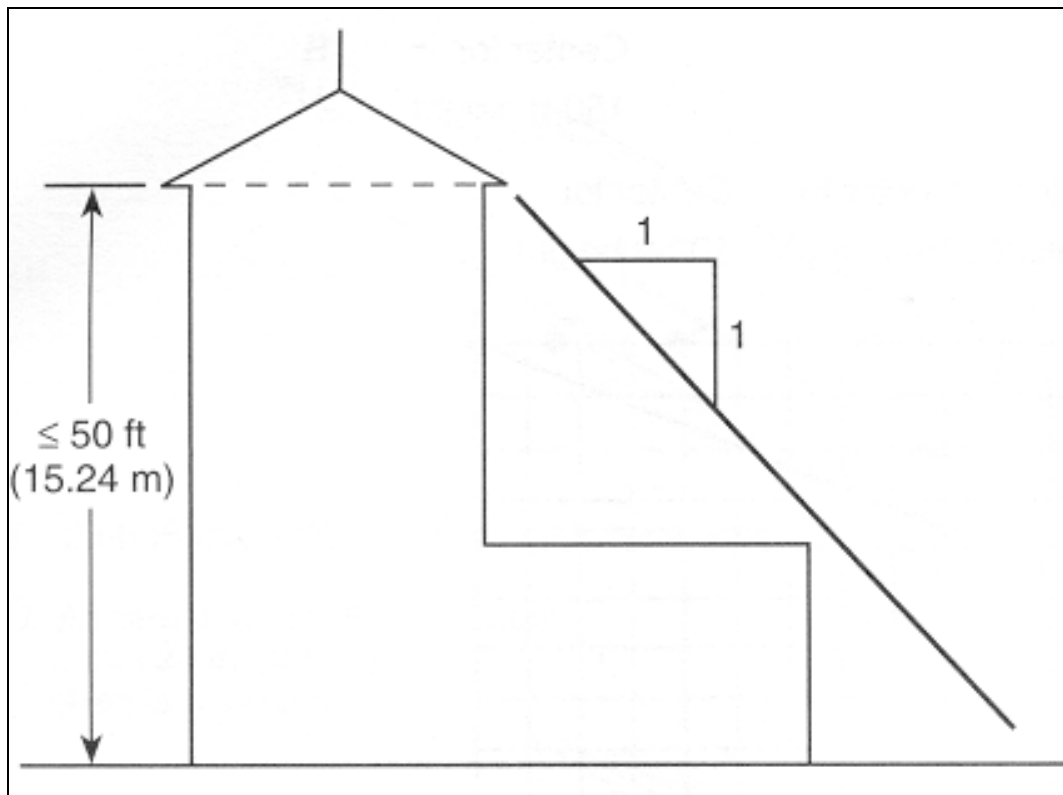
Lower roof protection for pitched roof 50-feet or less high
